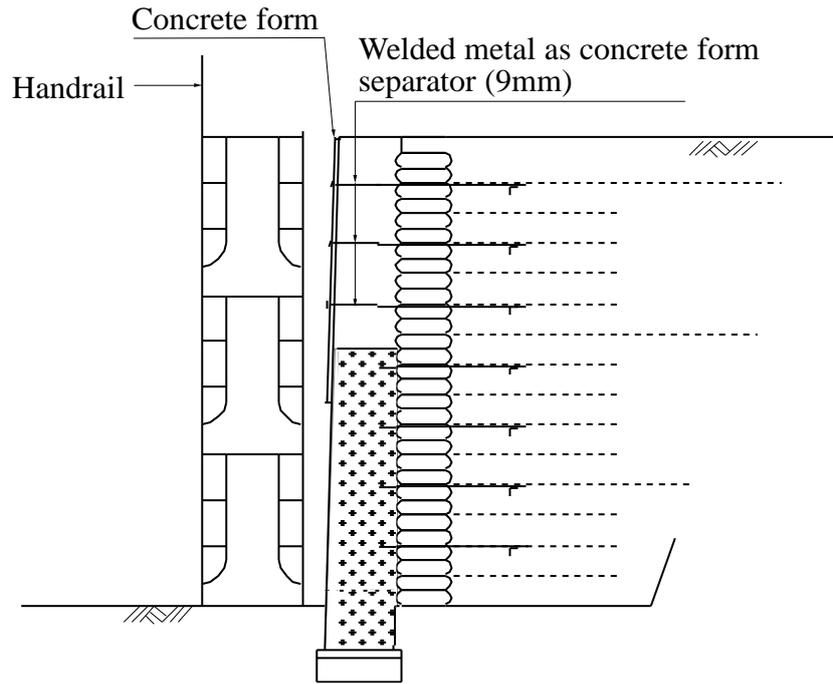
Typical fixing of concrete form for the facing construction by using sandbags
